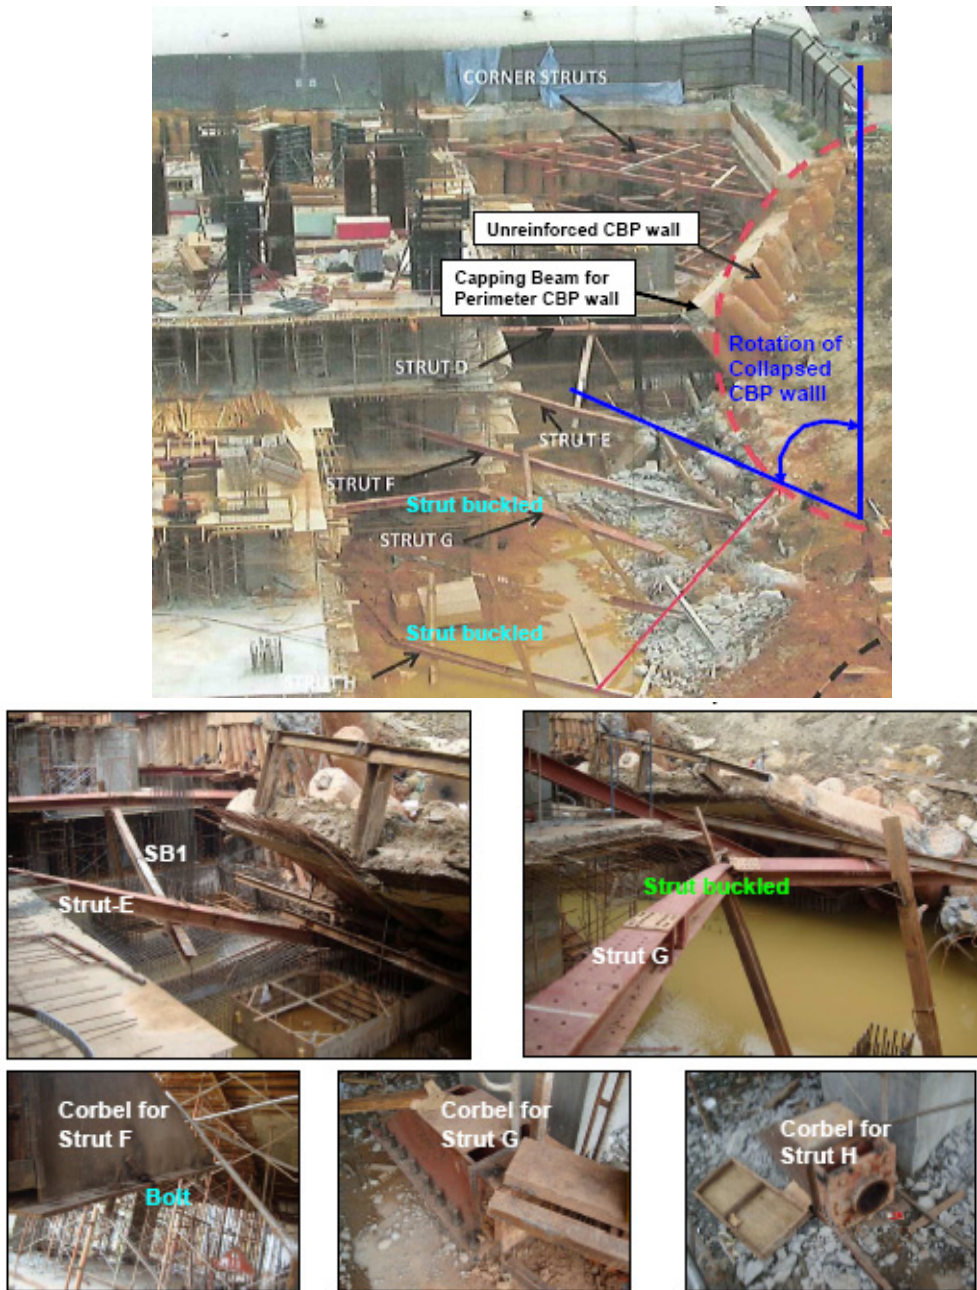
Site condition and strutting details after CBP wall failure
